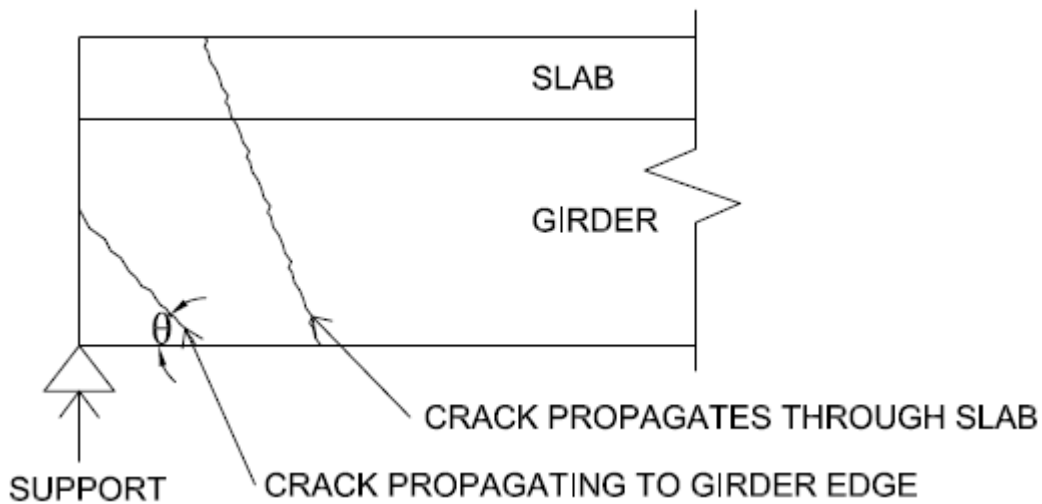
Crack Propagation to Either Top of Slab or Edge of Girder
